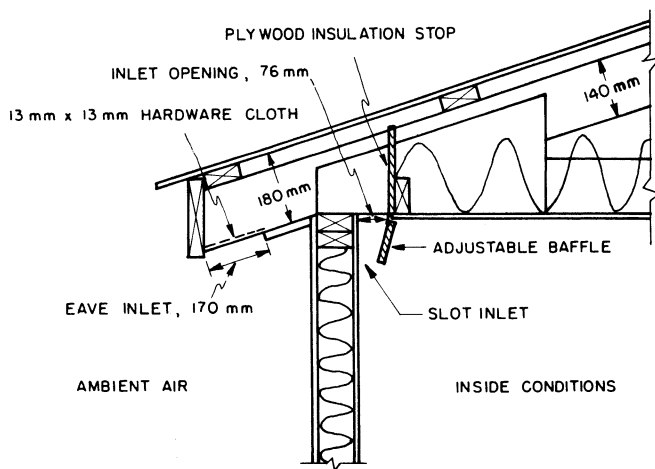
Slotted eave inlet construction details. (Not drawn to scale).
